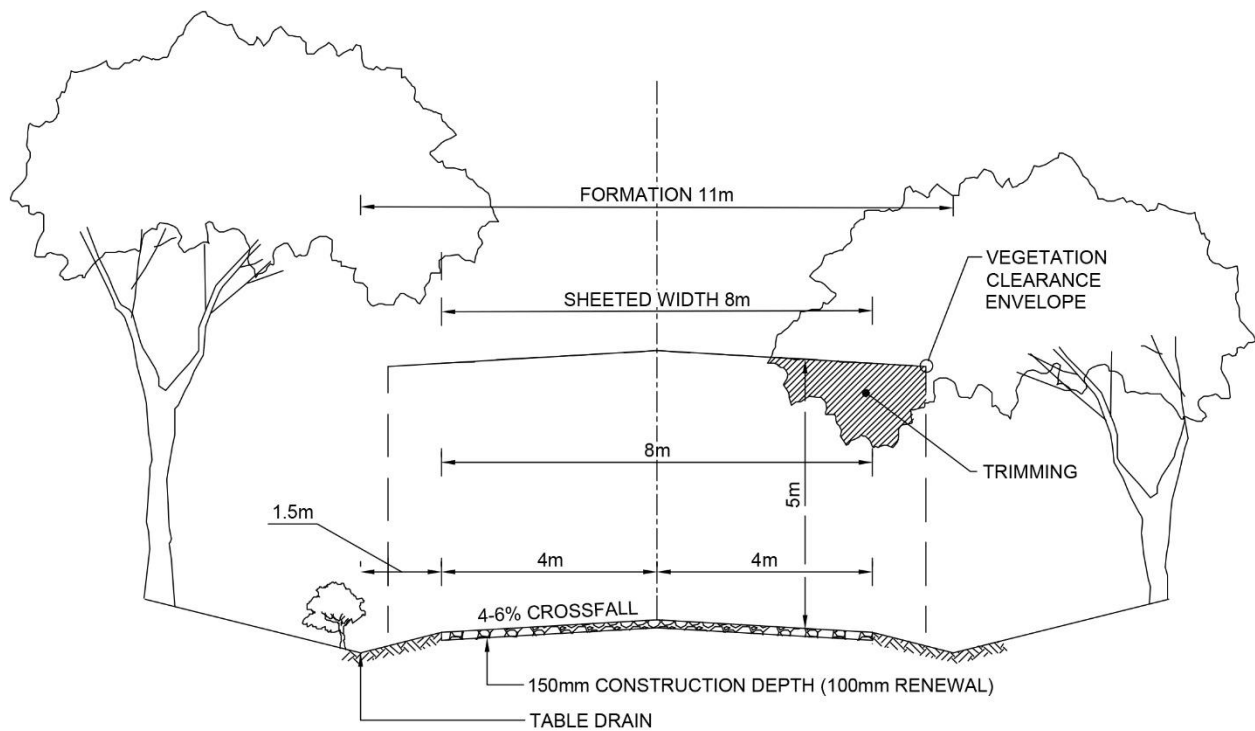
Rural Sheeted Category 1 Construction Cross Section
